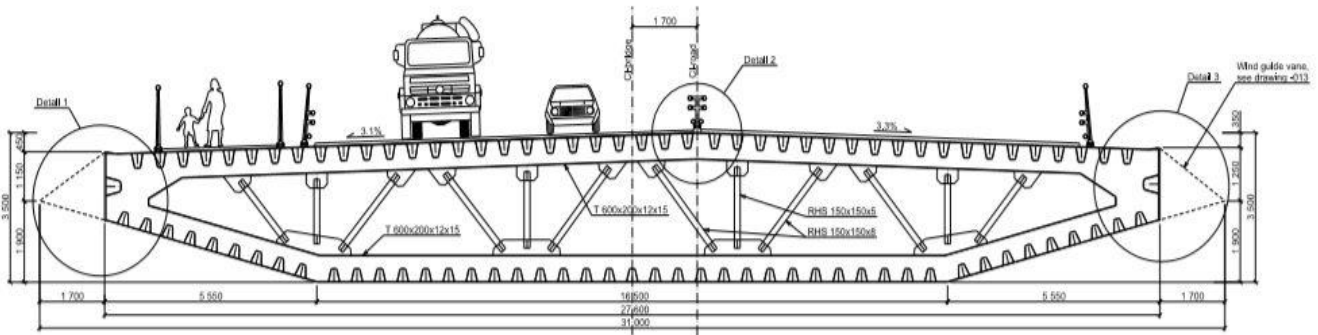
General cross section of bridge girder (Norconsult AS, 2017a)
